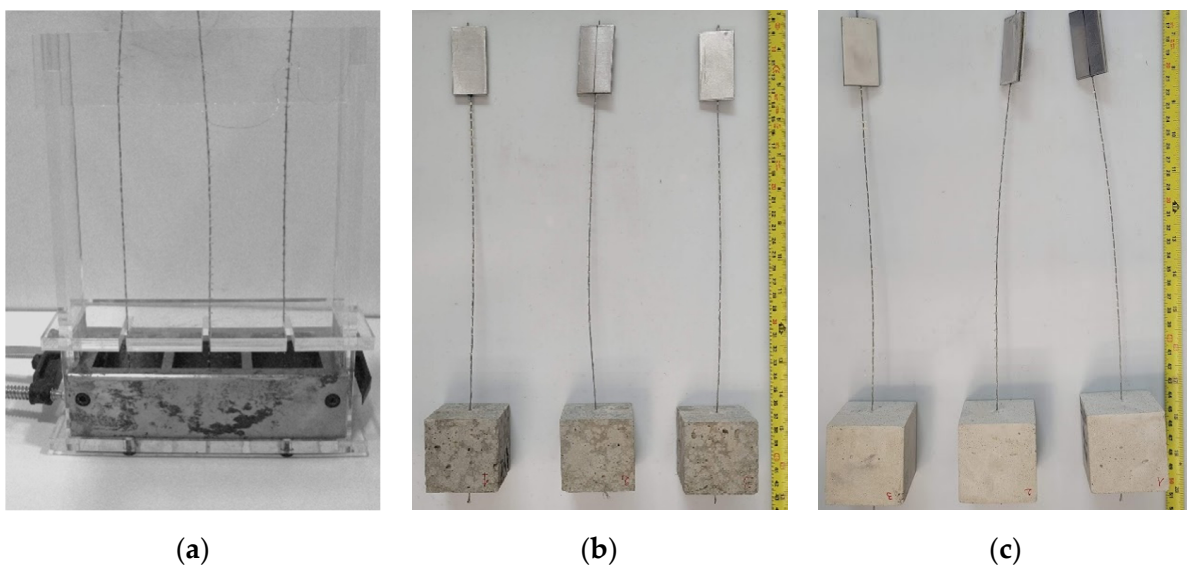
Manufacturing procedure for the pull-out tests. (a) Single cords positioned in a bespoke acrylic frame and steel mold. (b) ‘HW-GLT’ specimens equipped with tabs. (c) ‘HW-GCF’ specimens equipped with tabs.
